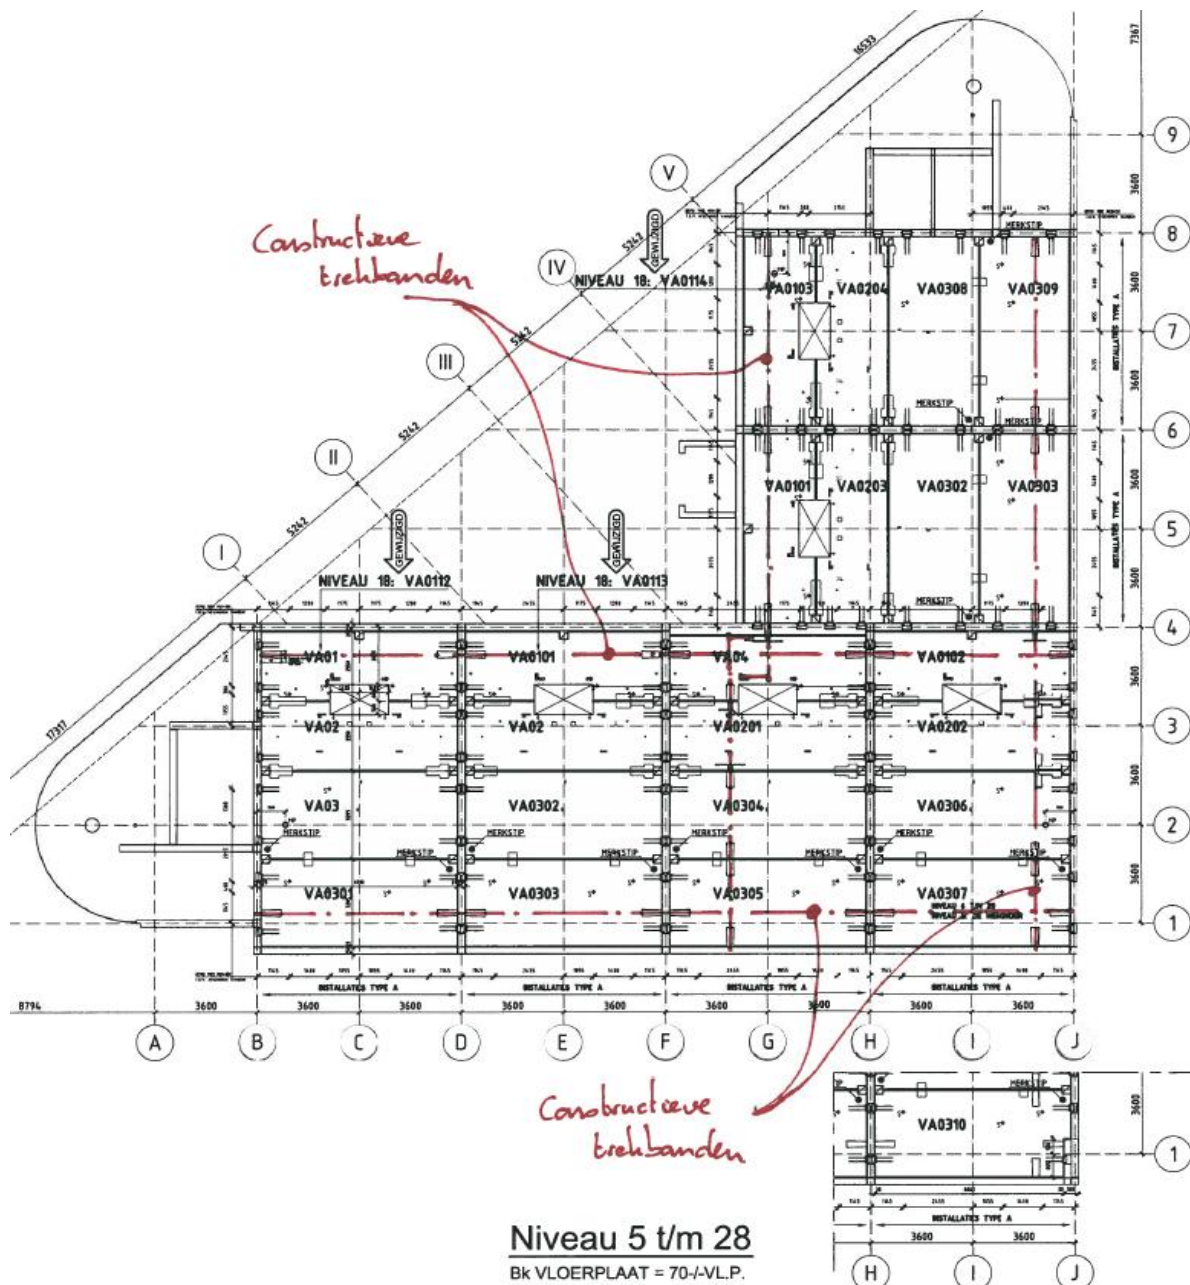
Floor layout from Het Strijkijzer [Hurks Beton]
